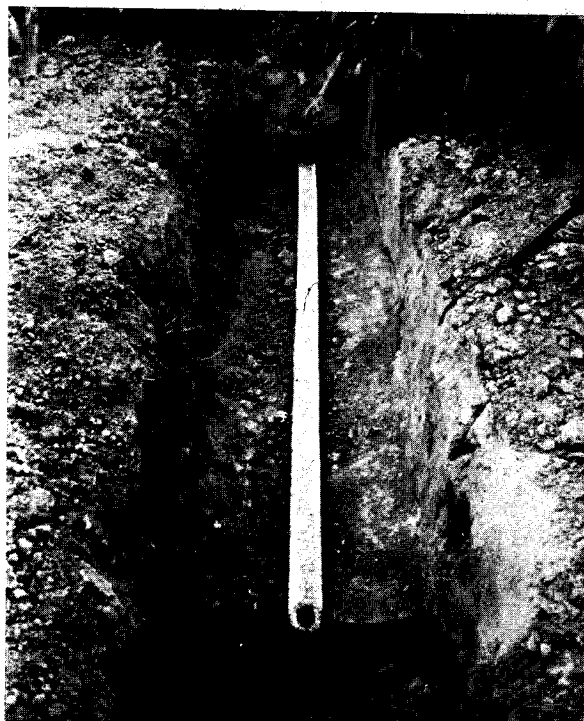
Concrete Pipe Made with Machine Shown in Fig. 5. From Janert (17, p.284)
